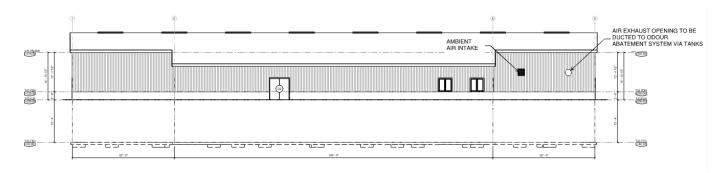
Feedstock Pumphouse Building with Air Intake and Air Exhaust Opening
